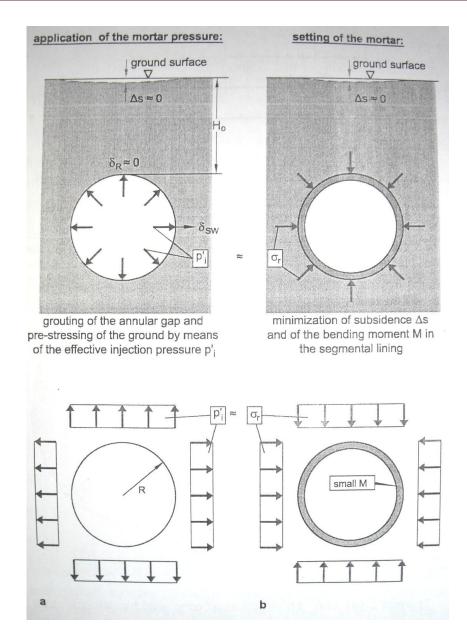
Pressures acting around the tunnel regarding the backfill grouting. (Wittke, 2007)
